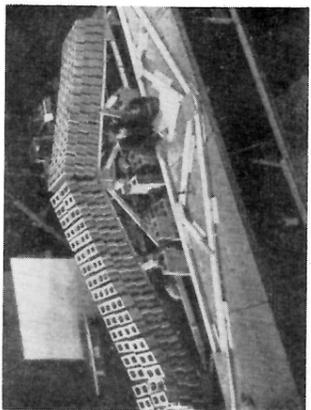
Load test on a prefabricated timber roof truss for use in house construction being carried out at the Building Research Centre of the National Research Council in Ottawa, Canada.
